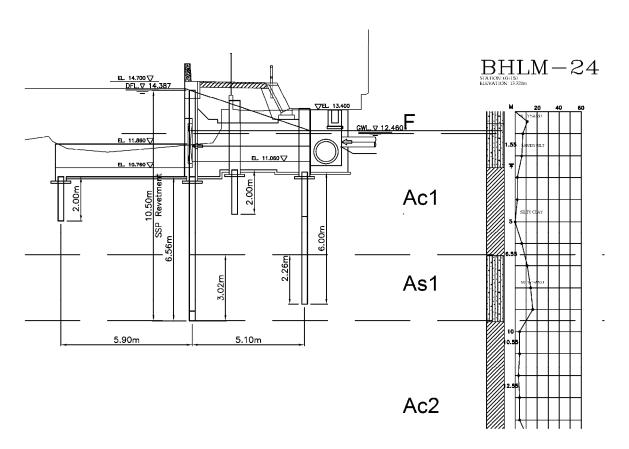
Length of SSP Cut off Wall (7/9) (MSR-2)
